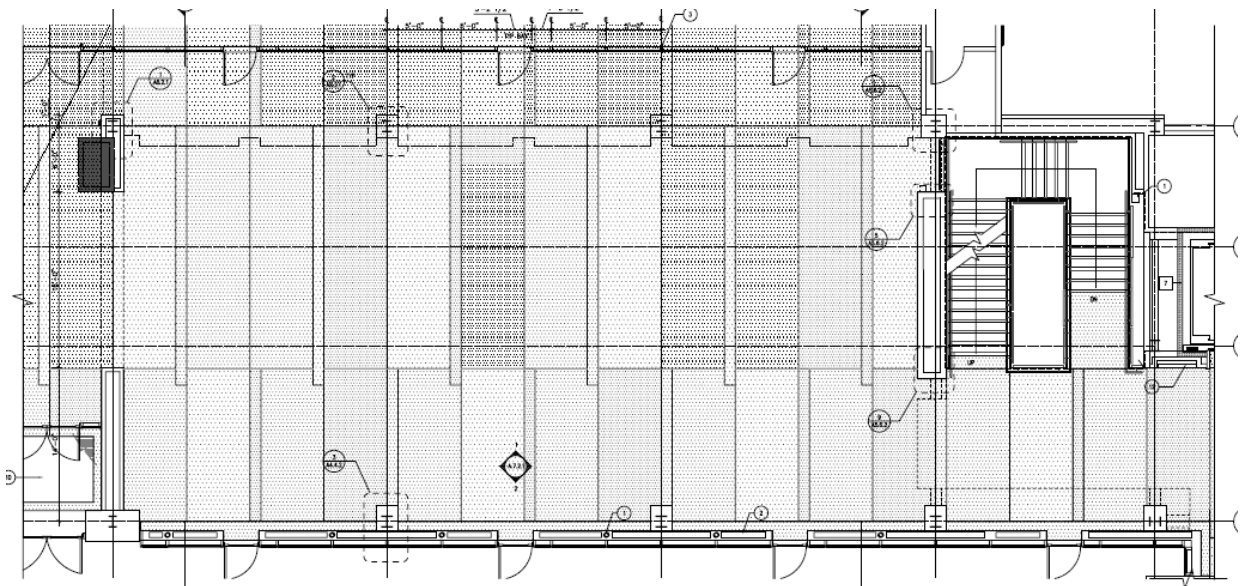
Atrium Floor Plan (original floor design)
